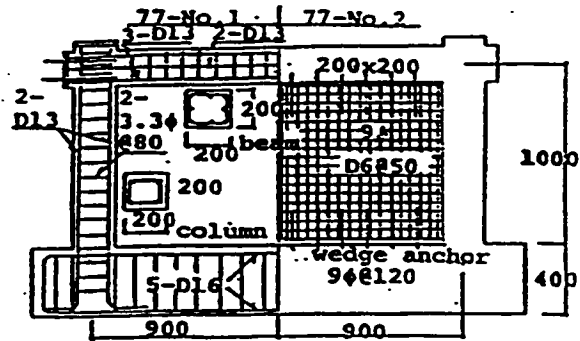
Moment frame specimen strengthened by infilled reinforced concrete wall
